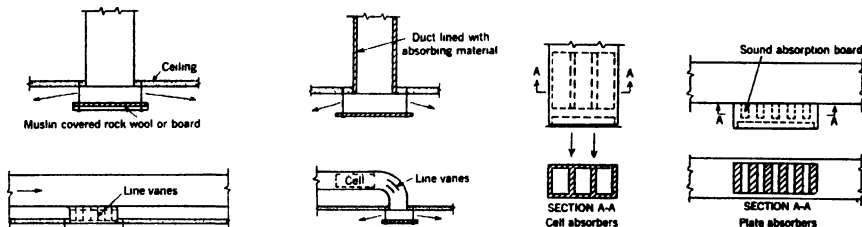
OUTLET CELLS FOR PAN OUTLETS OR GRILLES
